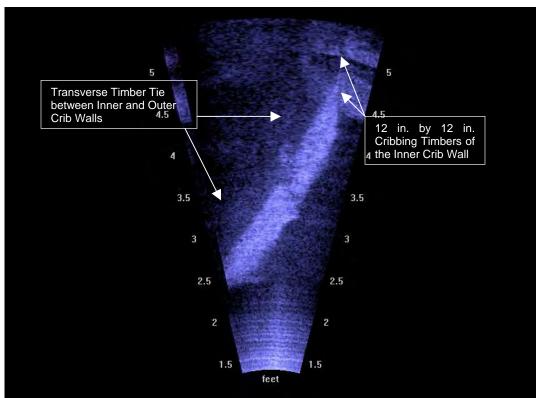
Sonar image showing transverse timber tie and inner wall in place.
